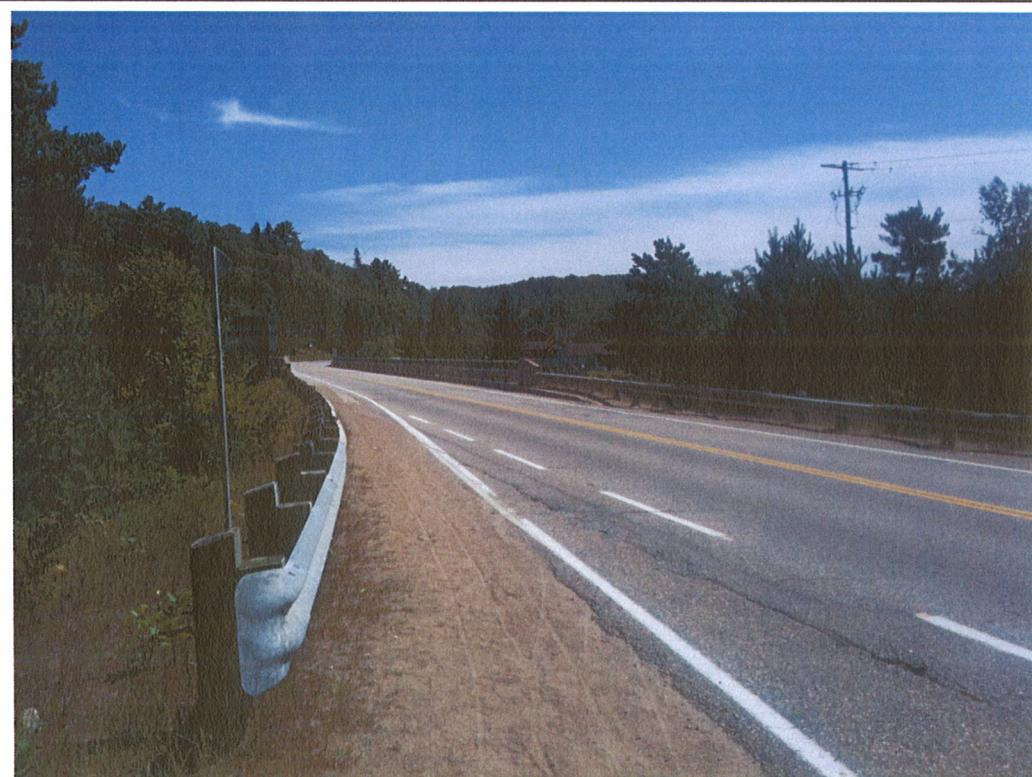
Looking East at Oxtongue Lake Bridge from West Approach
